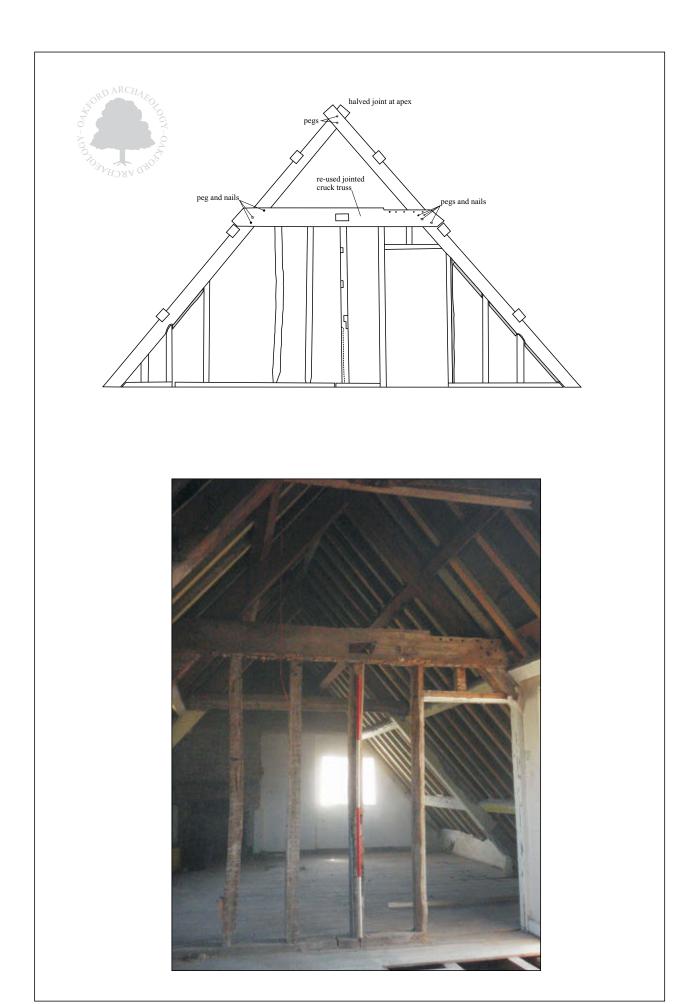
Second floor, main house showing typical 18th century partition and roof truss.
